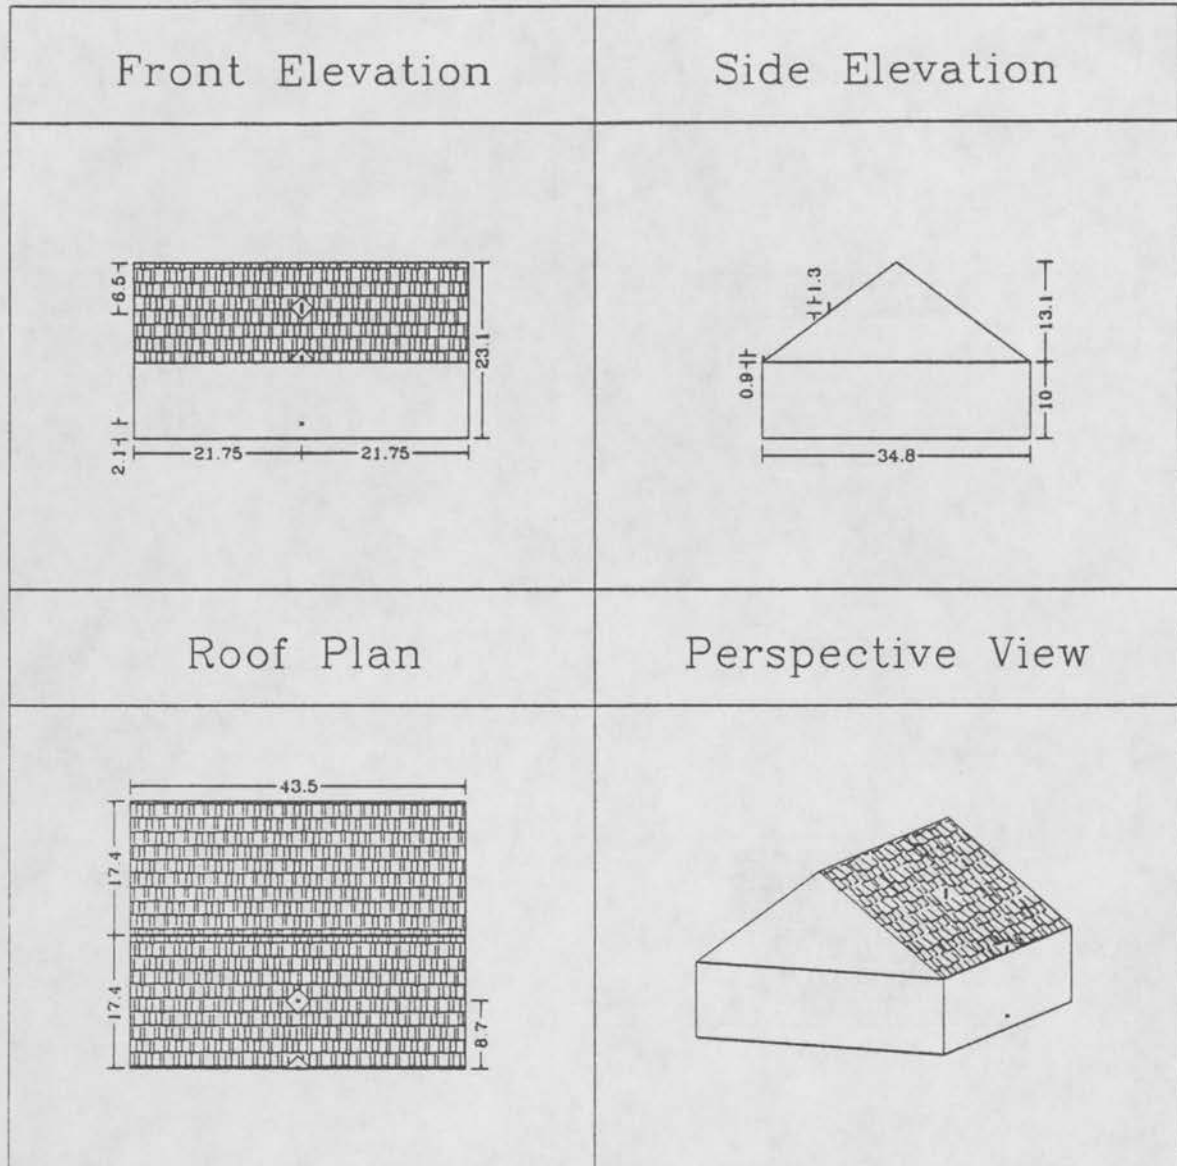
One Story House with 6:12 Roof Slope Dimensional Drawing
